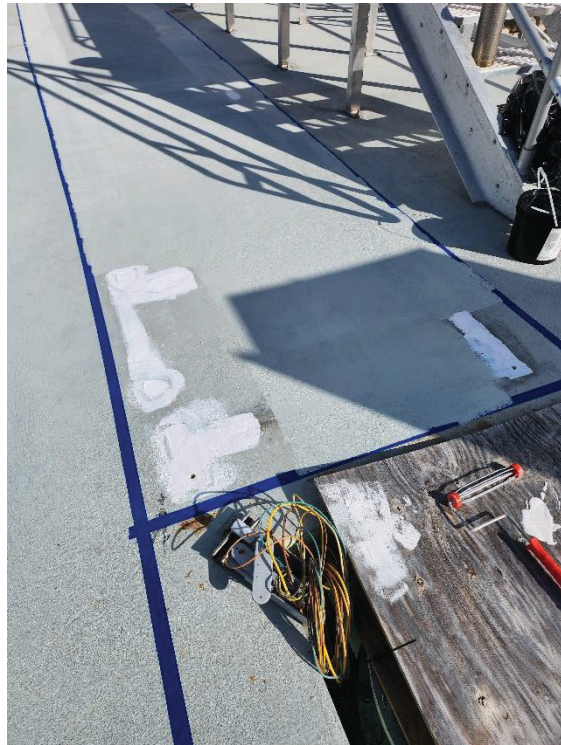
& 2. Installation Of The First Force Main Pressure Monitoring Equipment For The Collection System Monitoring Project
